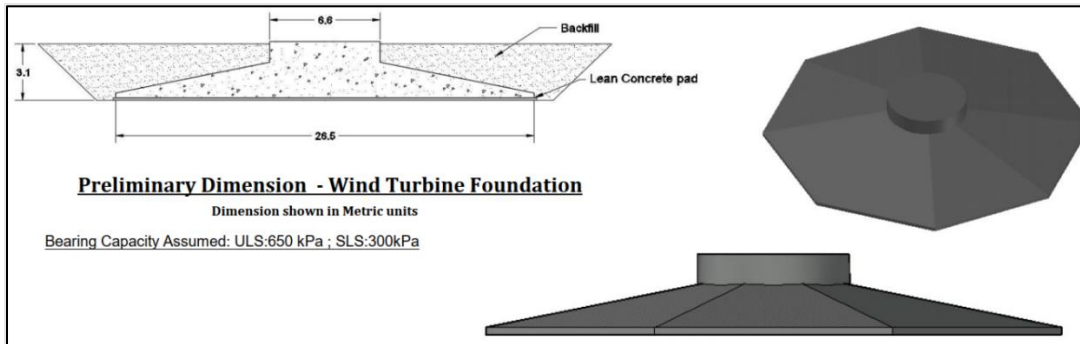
Typical Shallow Concrete Foundation with no Ground Water Schematic
